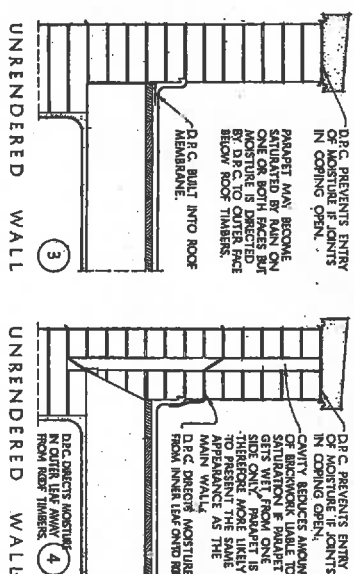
BAD AND GOOD CONSTRUCTIONAL DETAILS FOR PARAPET WALLS.
